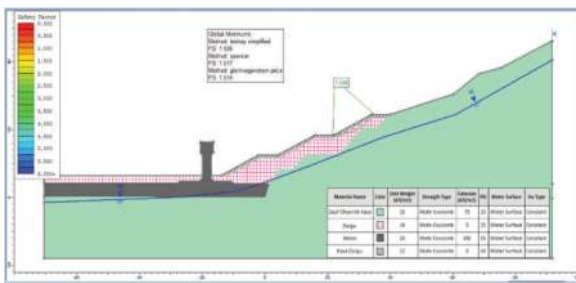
Diversion tunnel inlet conduit section static stability analysis (FS= 1.506 > 1.5).
